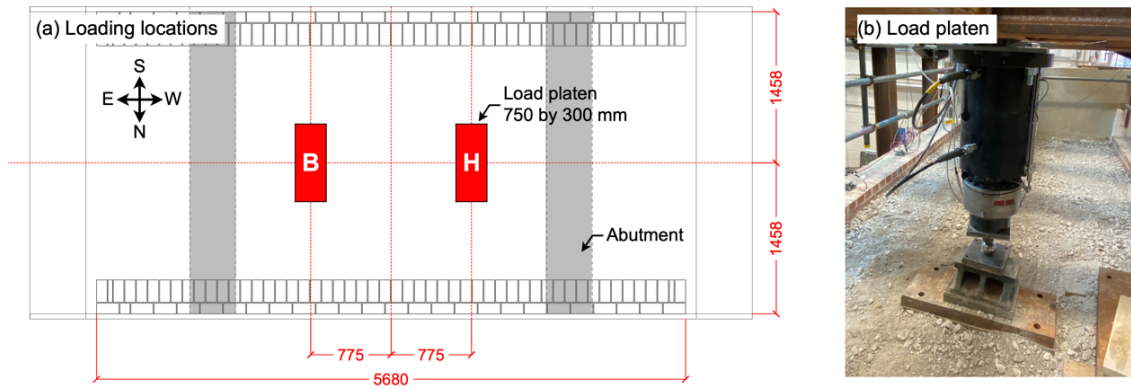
Bridge: (a) loading locations; (b) larger load platen used for high- and failure-level load tests (all units in mm).
